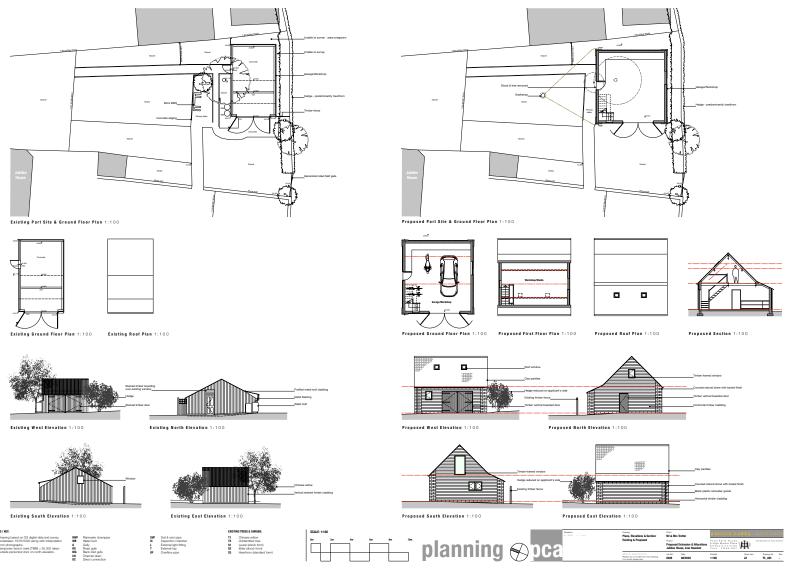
PL\_001 Plans, Elevations & Section: Existing & Proposed (not to scale)
